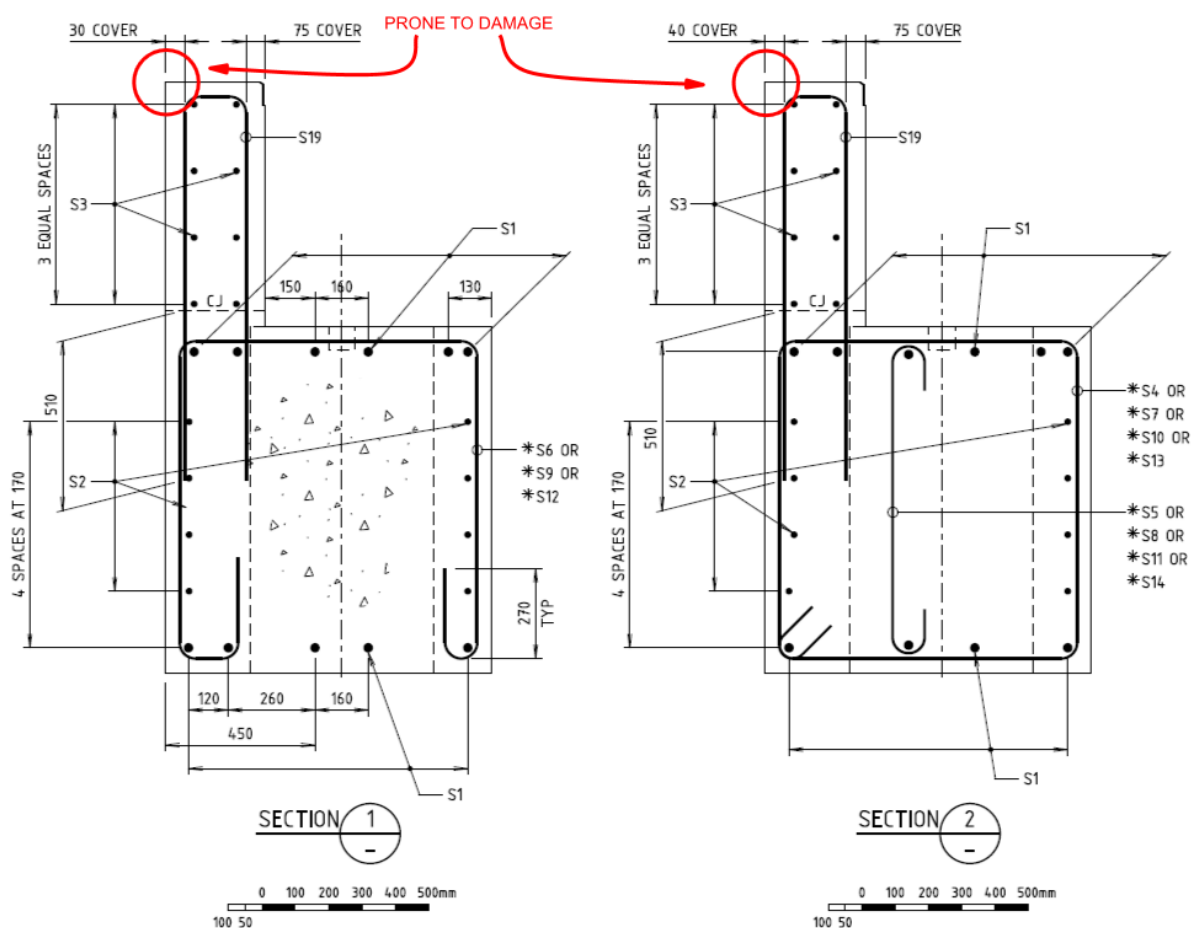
Potential concrete damage to Abutment sill beam (RMS [annotated], 2016)
